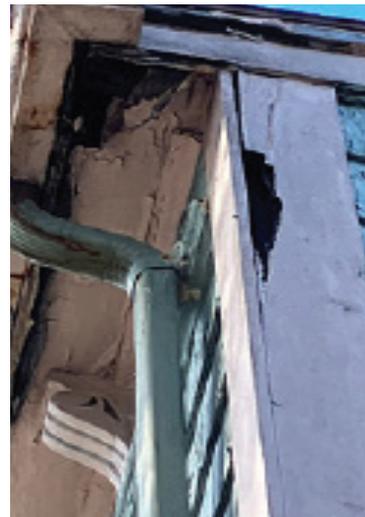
Soffits and corner boards will be repaired or replaced and repainted.
